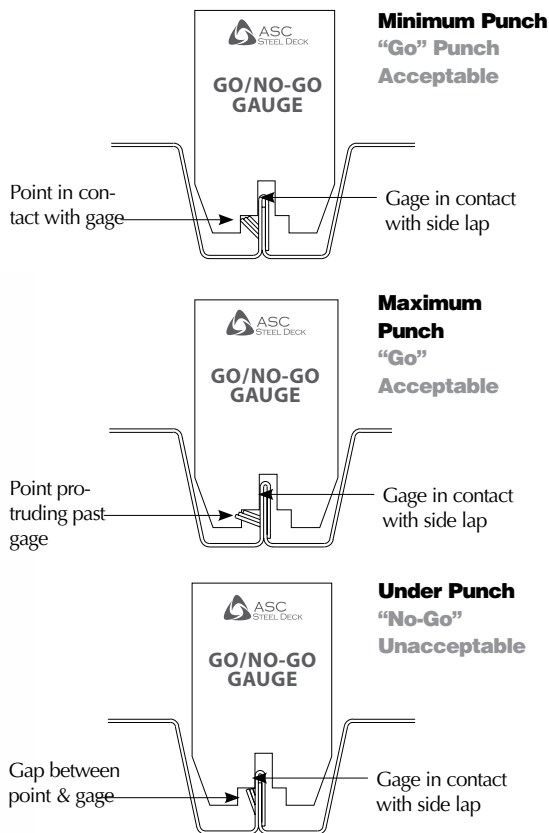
DELTAGRIP GO/NO-GO GAUGE
